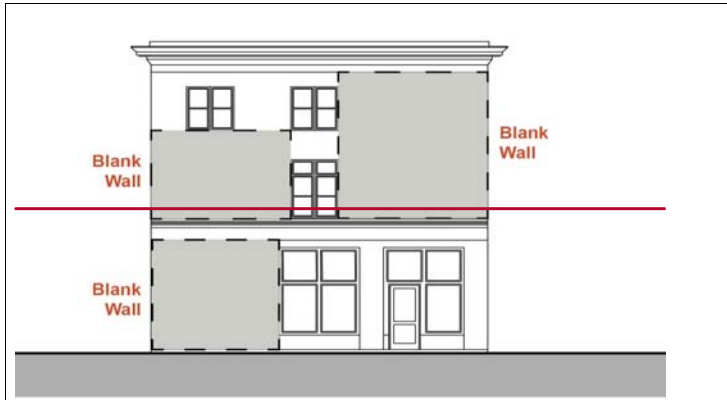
B25.20 – Ground and Upper Floor Blank Wall Limitations
